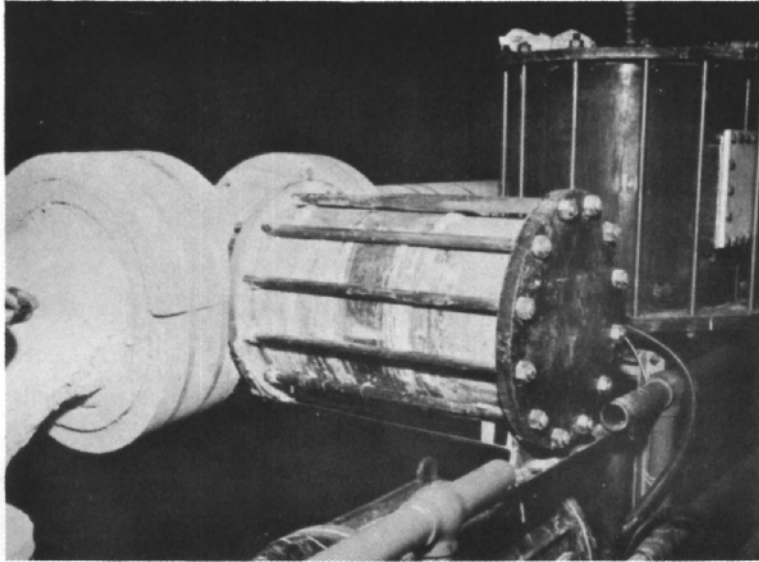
Concrete pipe section undergoing severe test in 290° F synthetic sea water test environment. Photo PX-D-55279 NA
